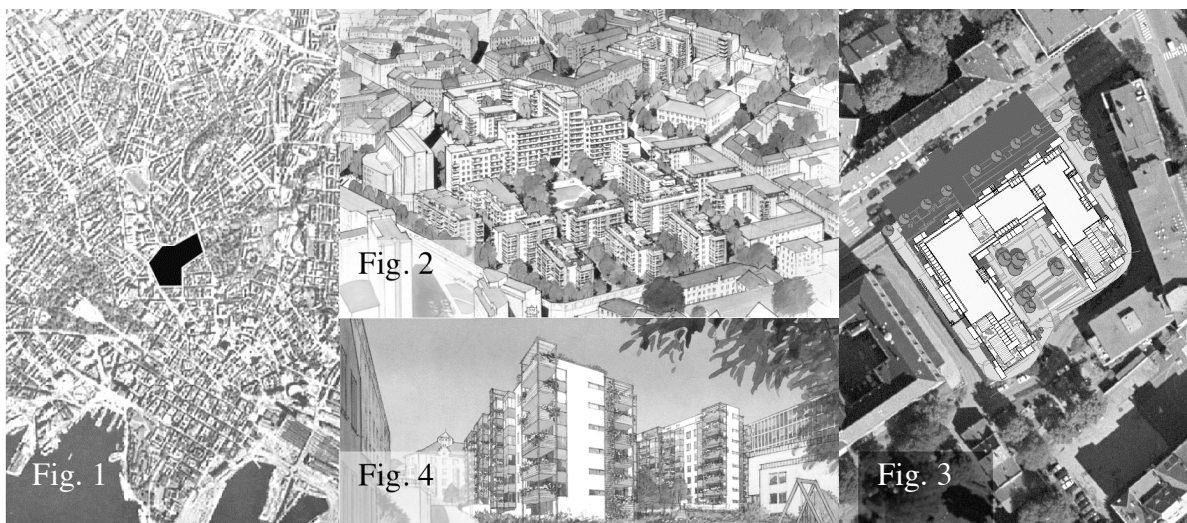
Location of Pilestredet Park. Fig.2: Perspective overview. Fig. 3 and 4: Area H, containing the first 155 of a total of 550 dwellings to be built by Selmer Skanska and OBOS. The site plan (Fig.3 shows common roof terraces connected to each staircase.) Green roofs will be a distinct feature in the new housing projects in Pilestredet Park.
